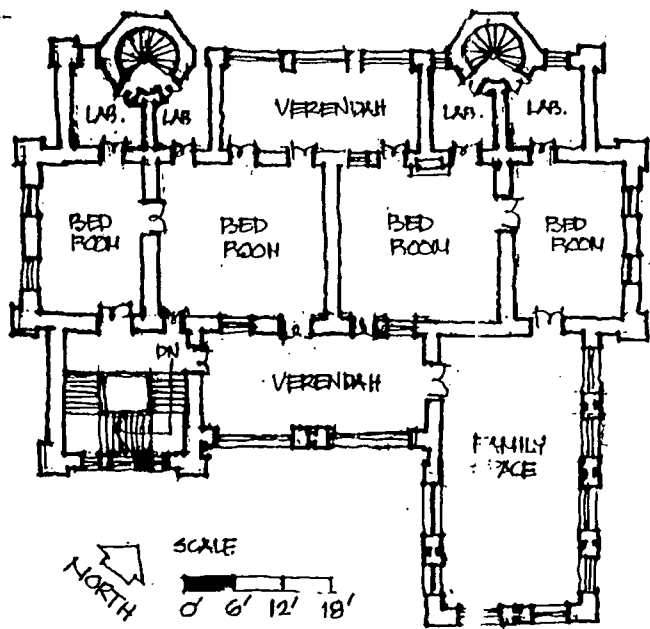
First floor plan, D.M. Bungalow, Rajshahi
